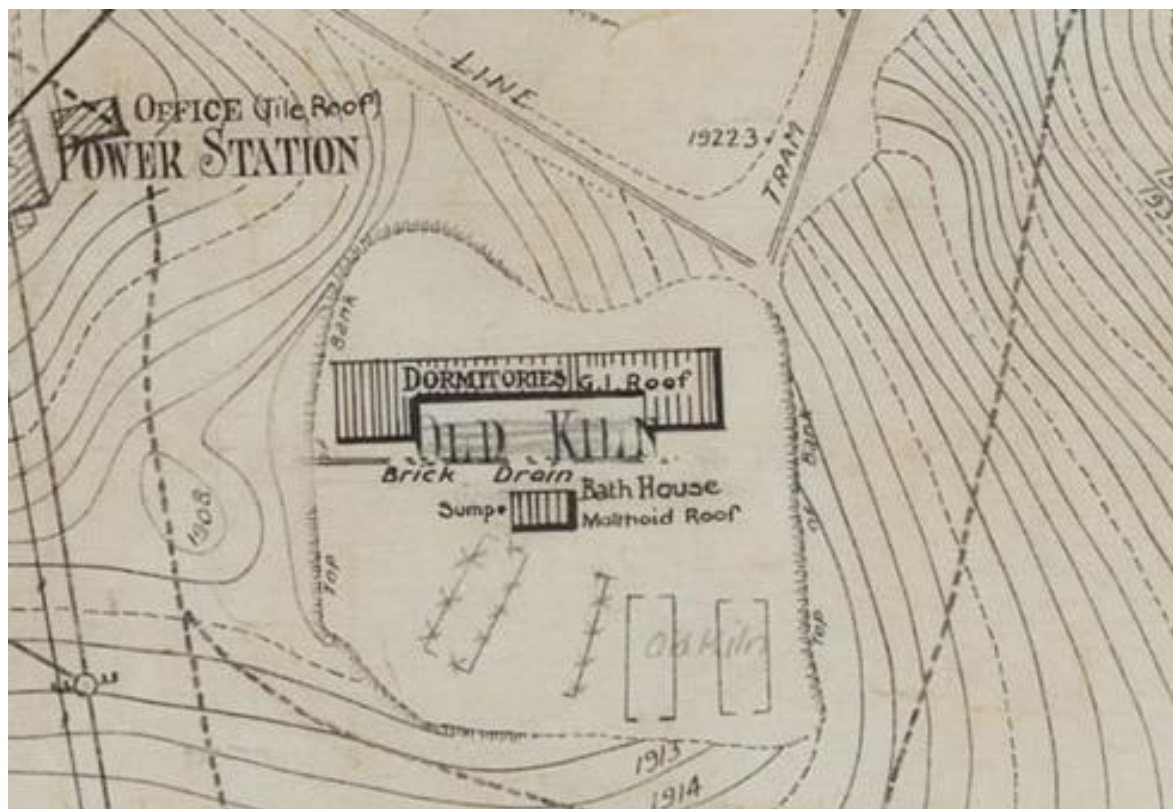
Detail from the 'Contour and Detail Survey, Canberra Brick Yards, 20 December 1916'. (Source: NAA A6664, L165A)
